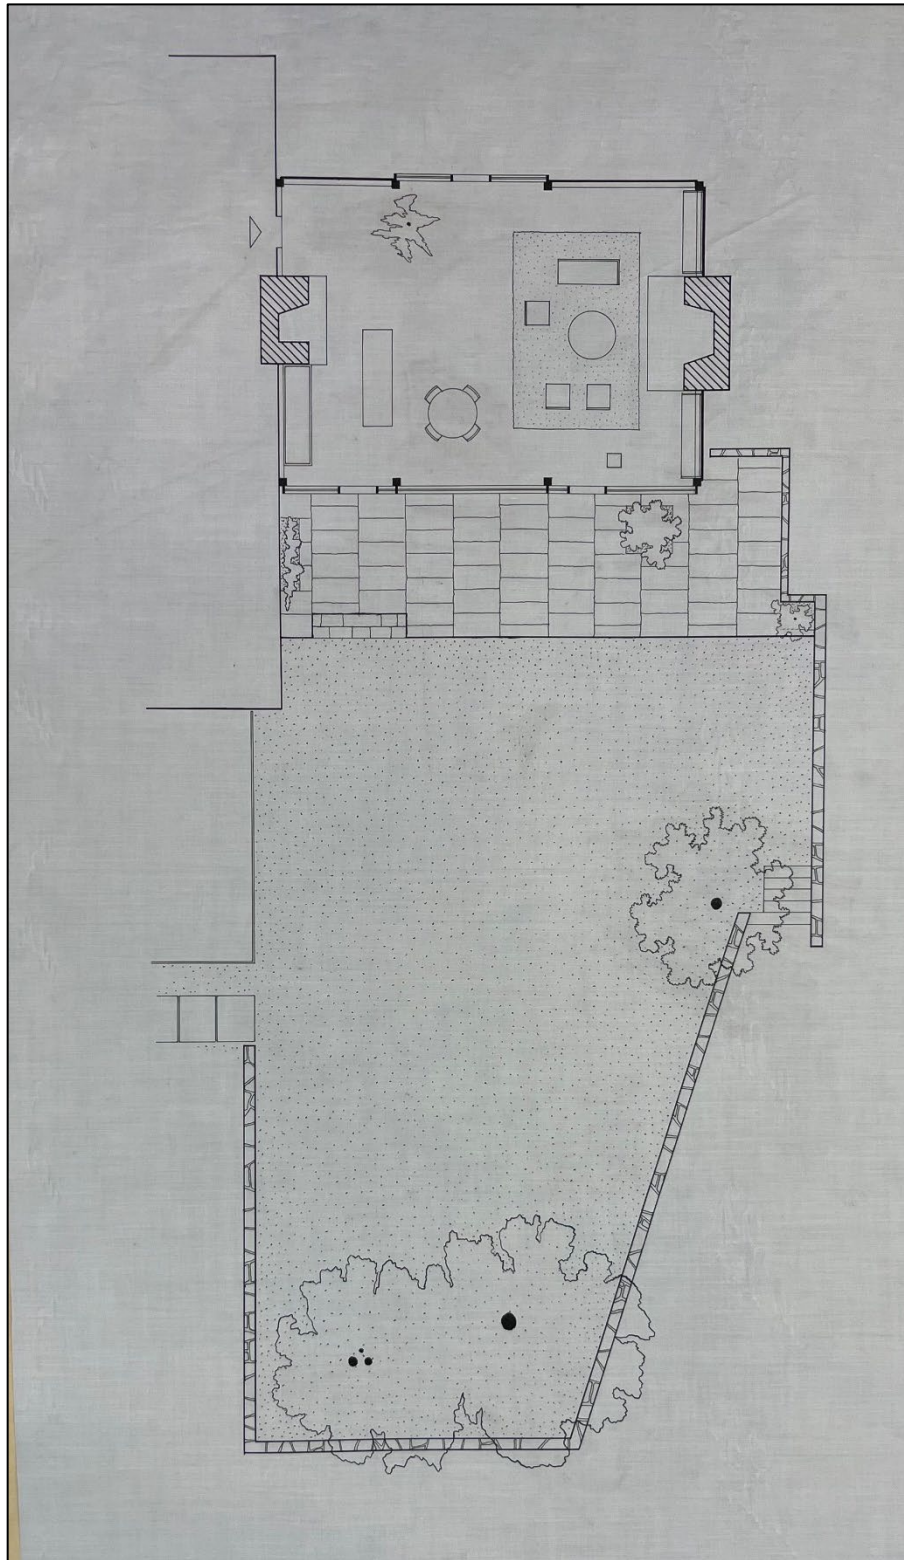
Walled Garden Plans (Johnson Papers, Avery Library, Columbia University).
